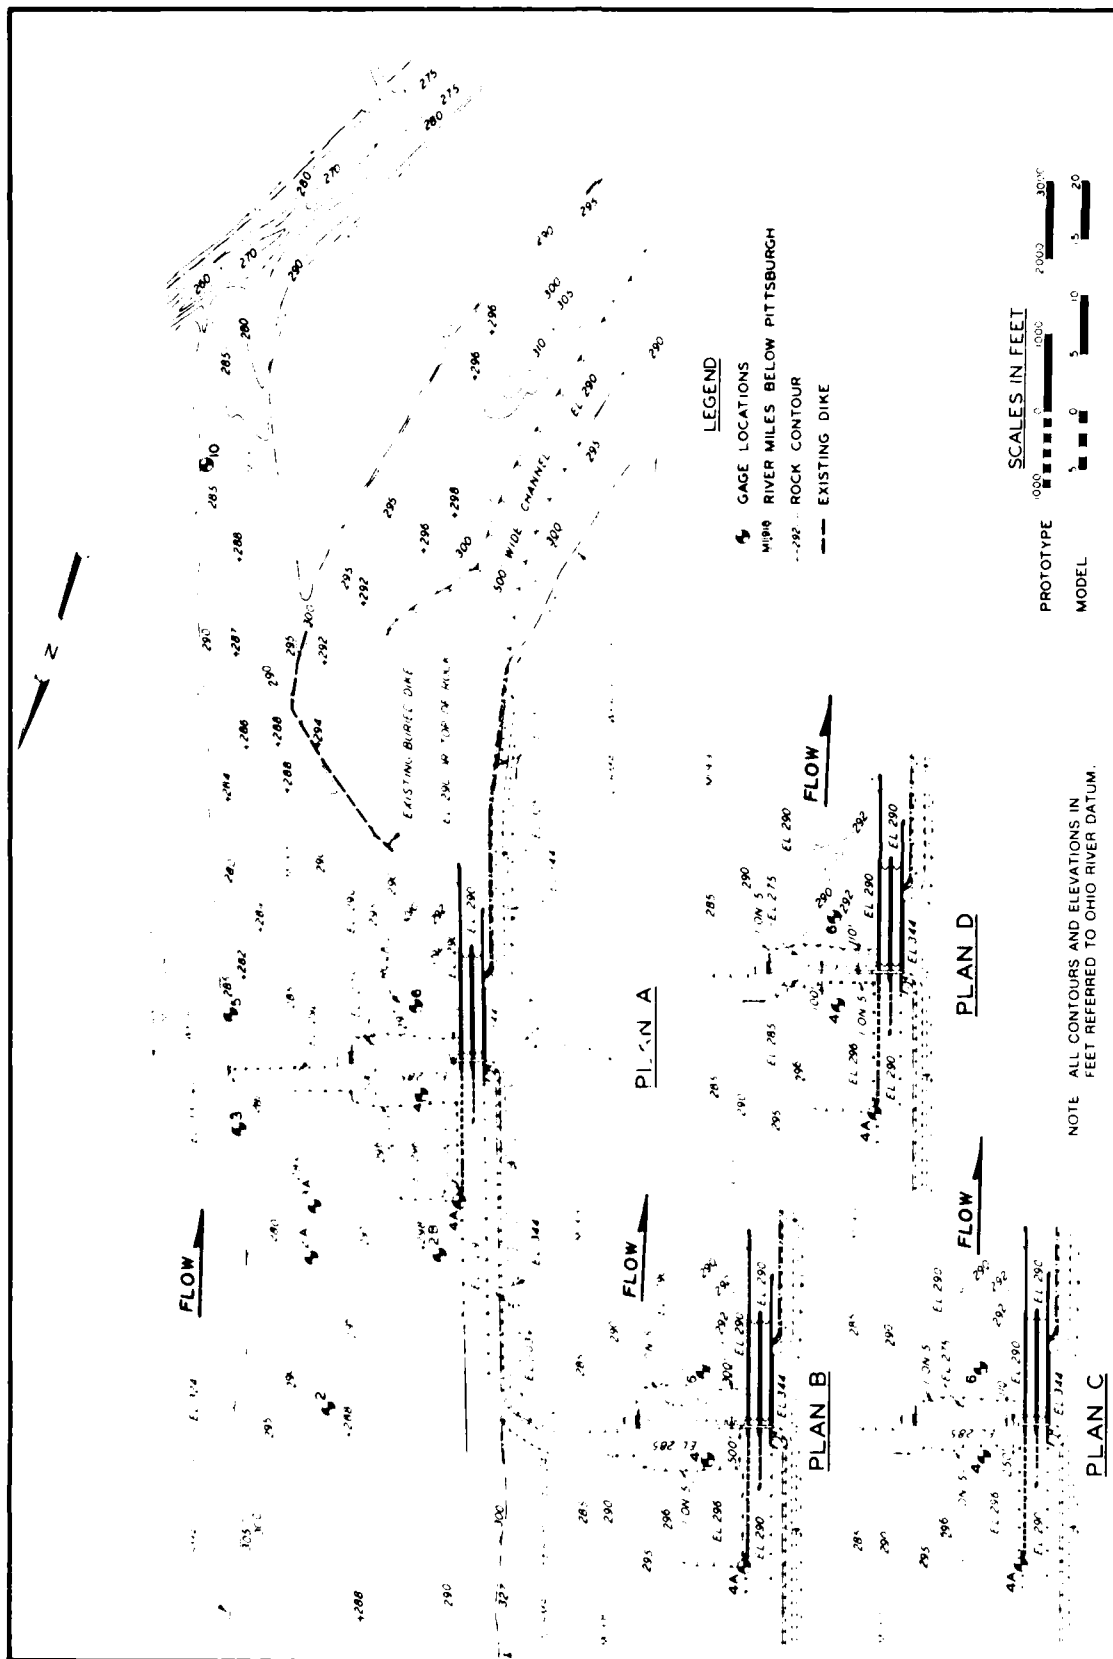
Spillway excavation Plans A, B, C, and D; 11-gate spillway excavation plans
